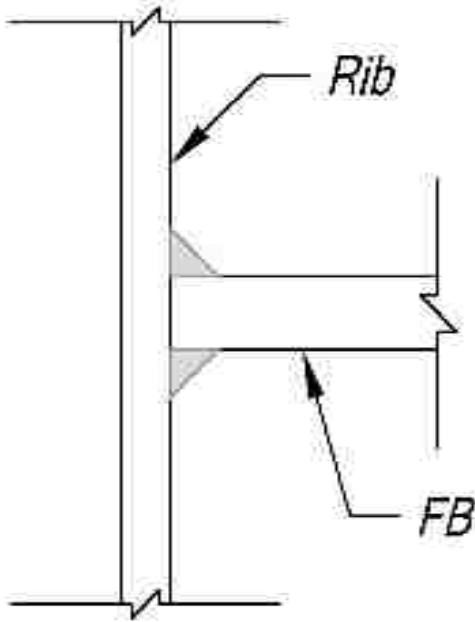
Rib-to-floor beam connection with continuous ribs passing through cutout in the floor beam
